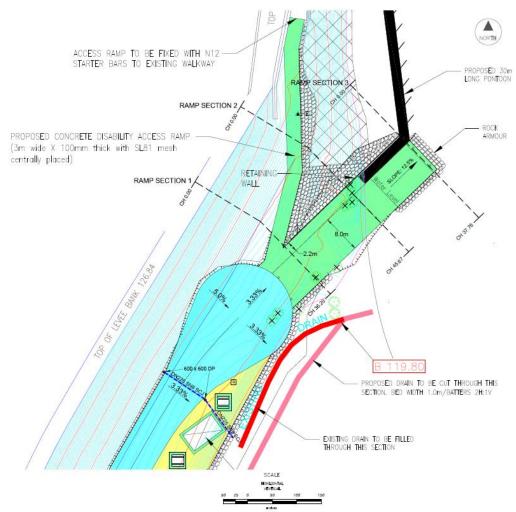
Proposed Site Plan (Boat Ramp Details)
